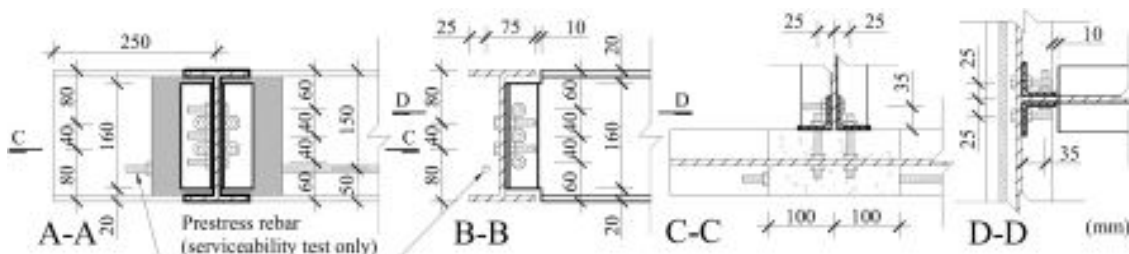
Details of the concrete jackets and connections between main and secondary girders.
